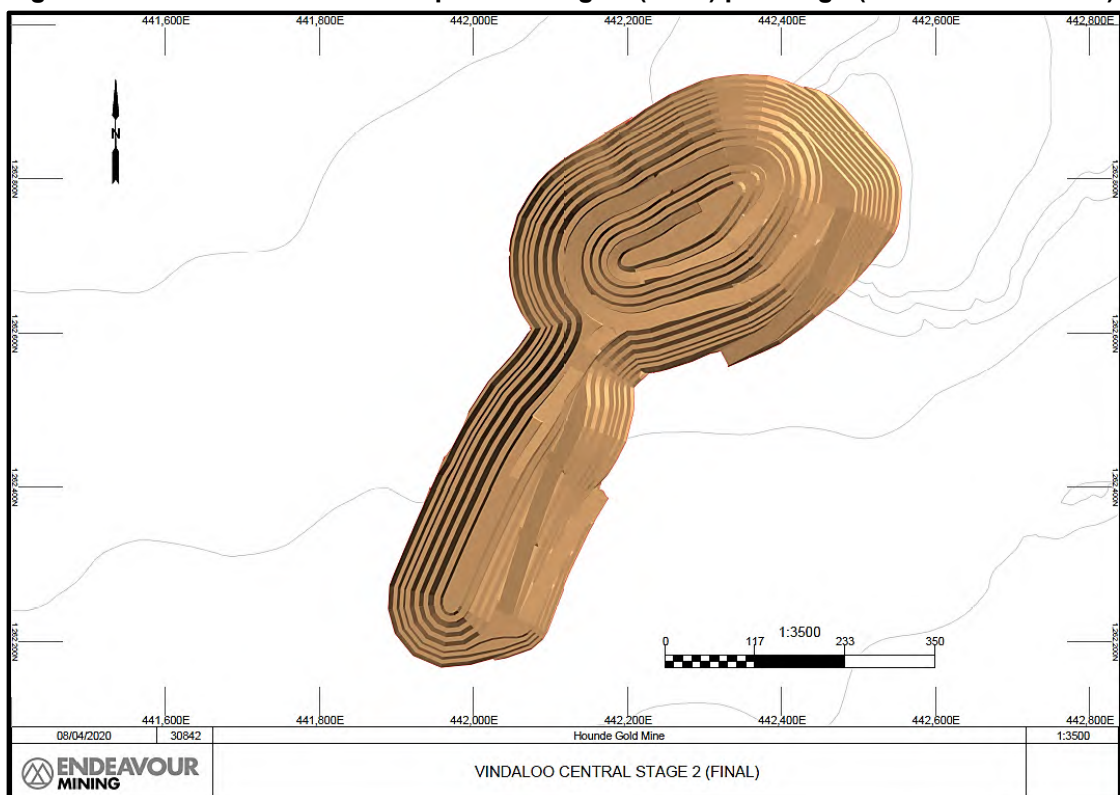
Vindaloo Central Open Pit: stage 2 (Final) pit design (source: Endeavour)
